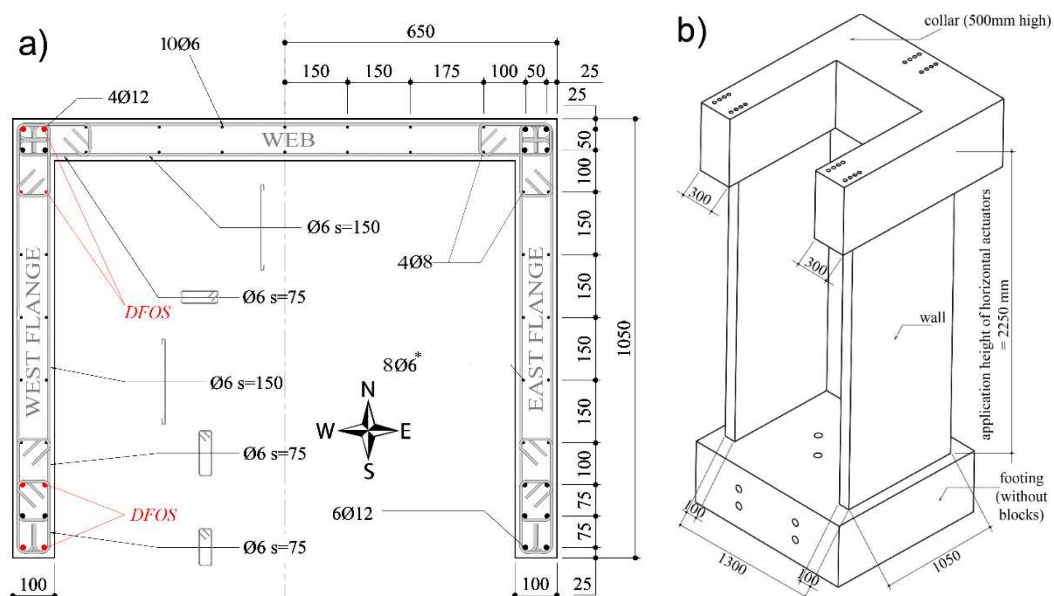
(a) cross-section and reinforcement detailing of the wall specimens (b) elevation view (not to scale)
